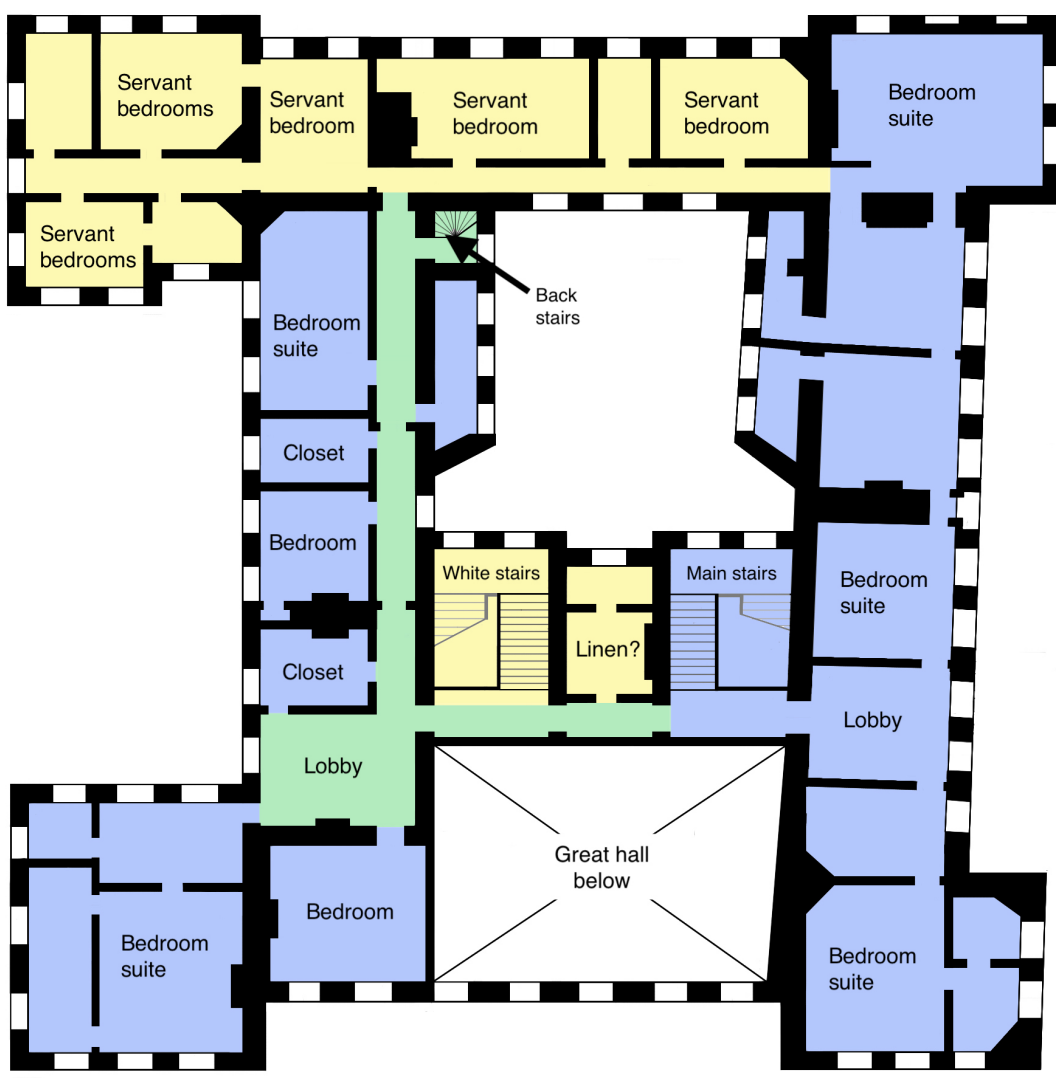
Calke Abbey c1704 Phase 1 first floor plan
